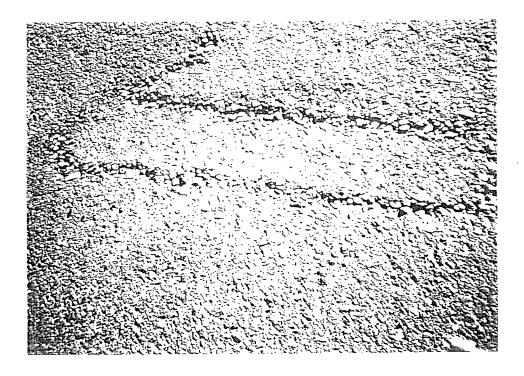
Grooves Cut in Pavement Surface with Sandblaster
